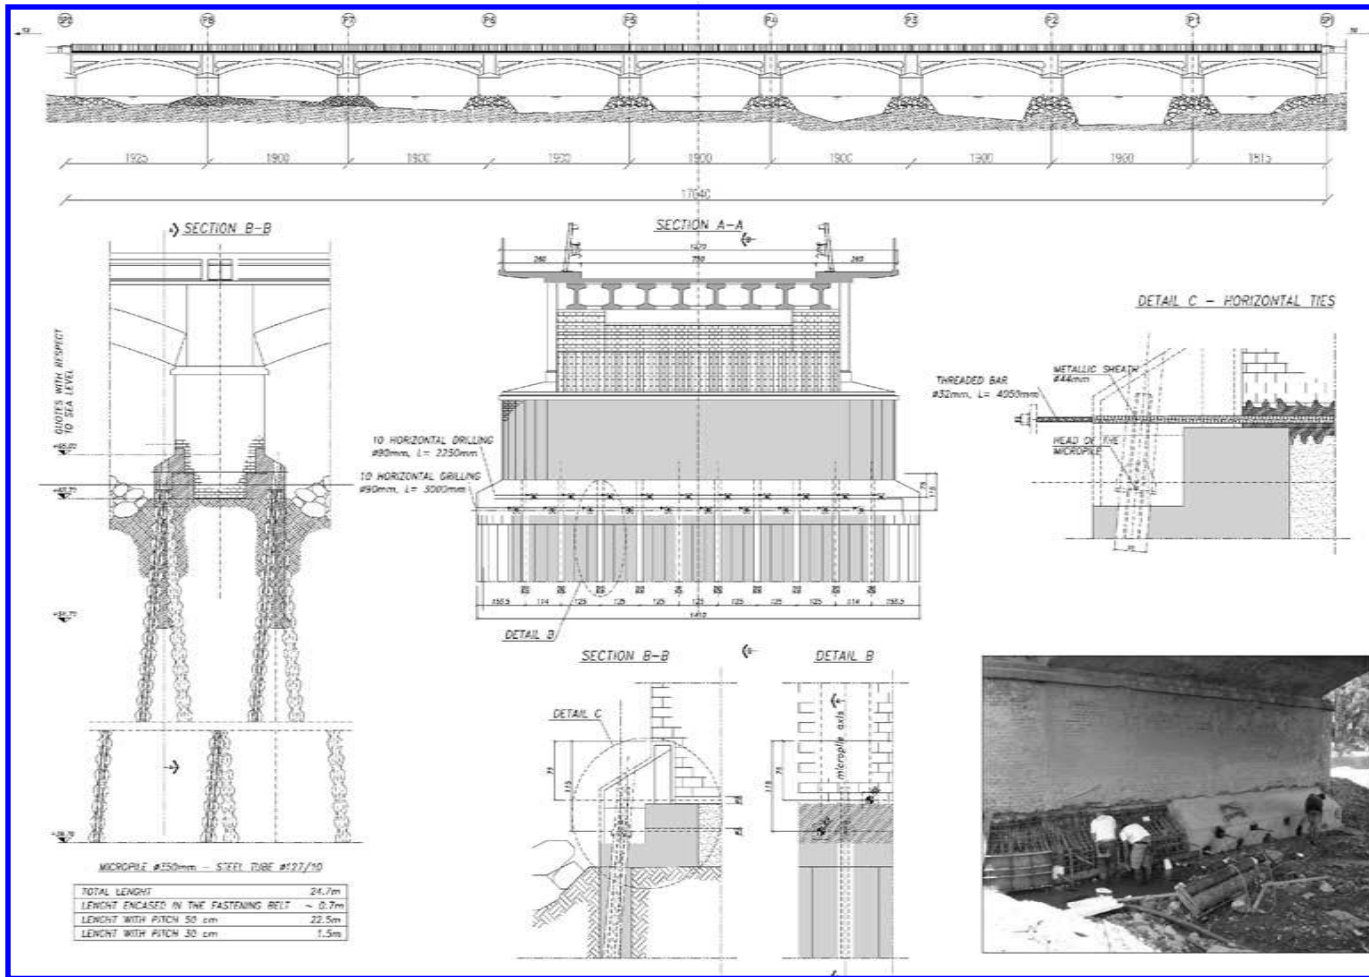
Lodi Bridge (1863–64). (a) front view of the bridge; (b) transversal section showing the new deck, made of precast prestressed beams, the position of the new piles and that of the threaded connecting bars; (c) arrangement of the micropiles at the two sides of a pier; (d), (e) details of the R.C. hooping crown; (g) photograph of an intermediate phase of the works.
